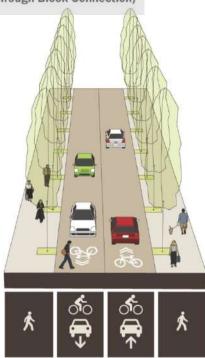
Narrow Street 1 (Through Block Connection)
